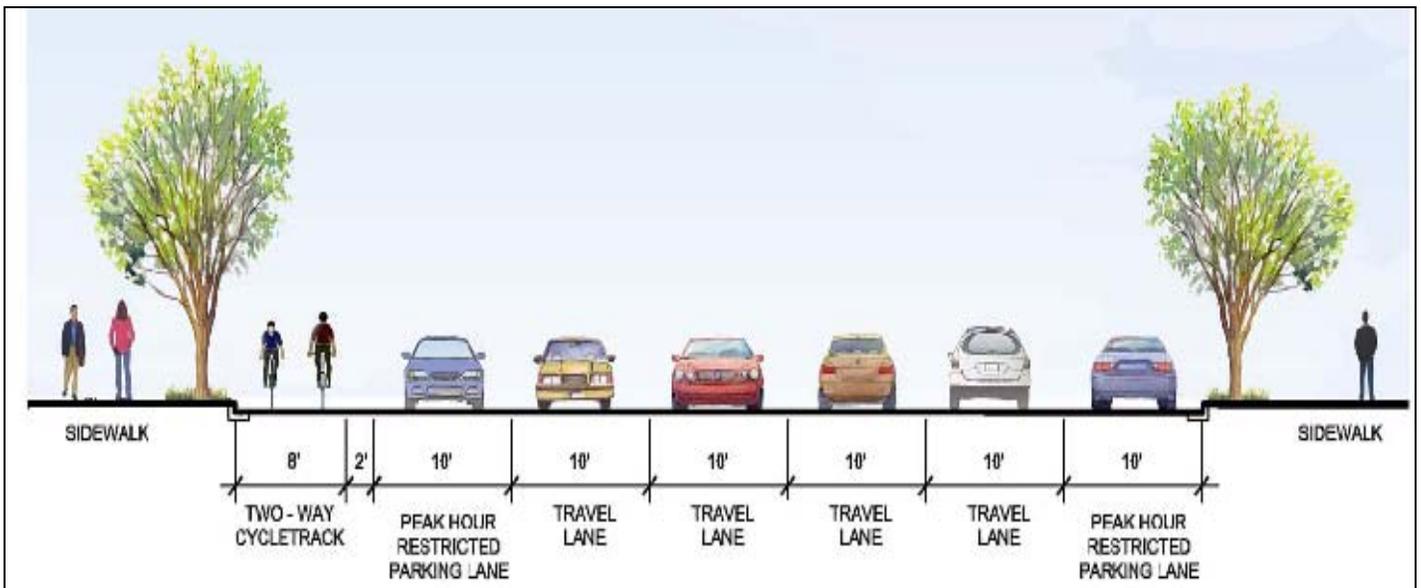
Typical street section showing the bike lane adjacent to a restricted parking lane, with flexposts not shown. This condition is only typical for the length of 15th Street, NW from Massachusetts Avenue and northward. South of Massachusetts Avenue, 15th Street, NW will not accommodate on-street parking, except on Vermont Avenue, between I Street, NW and H Street, NW.
